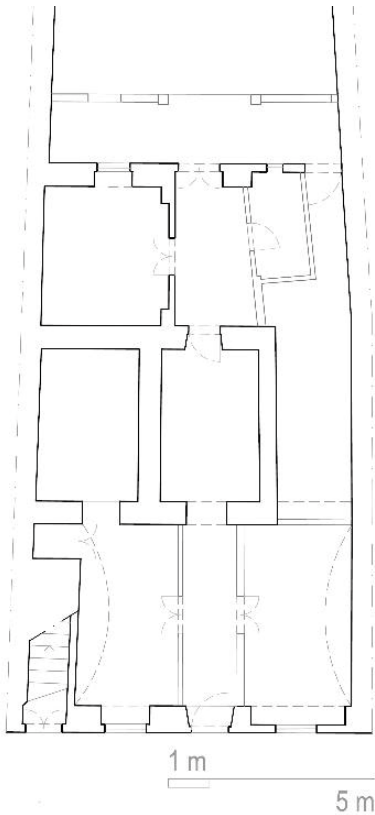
Groundfloor plan. Rua de Santa Catarina 13, Moura (Source: Rosado, 2021).
